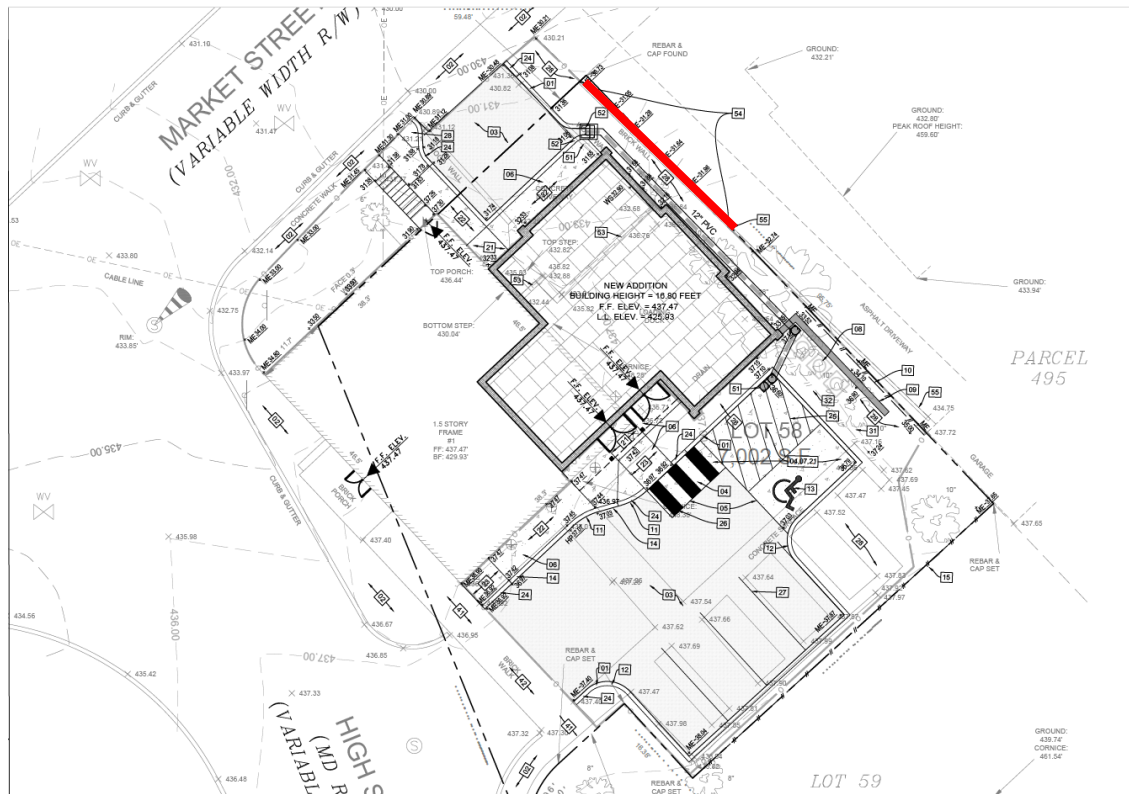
Excerpt of Sheet C2.01. The length of wall to be removed is shown in red.
